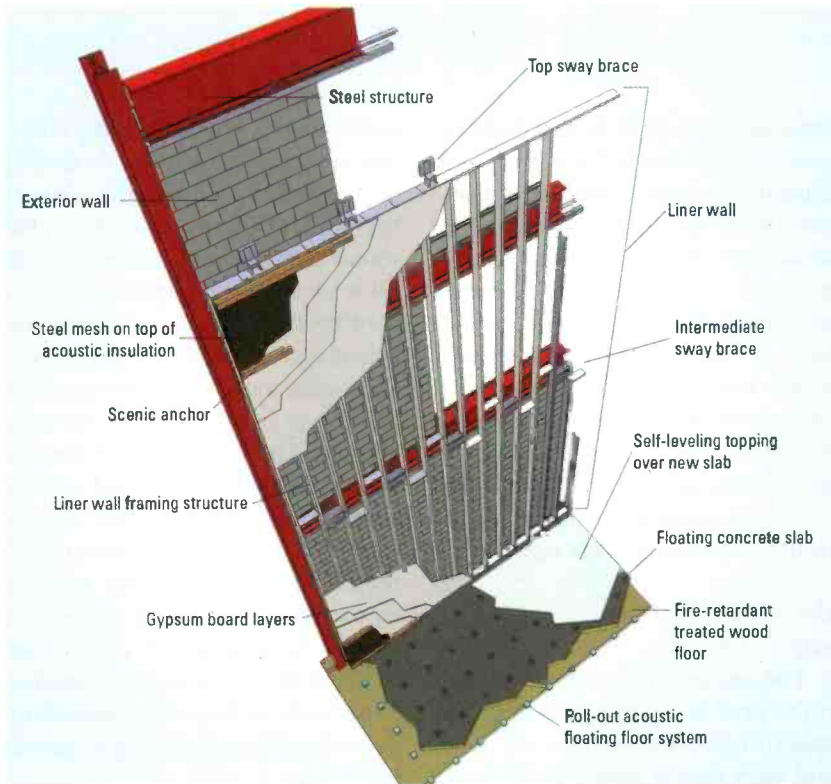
An acoustically isolated wall and floor construction are important when designing a TV studio. The wall system provides lateral acoustical protection from adjacent spaces.
